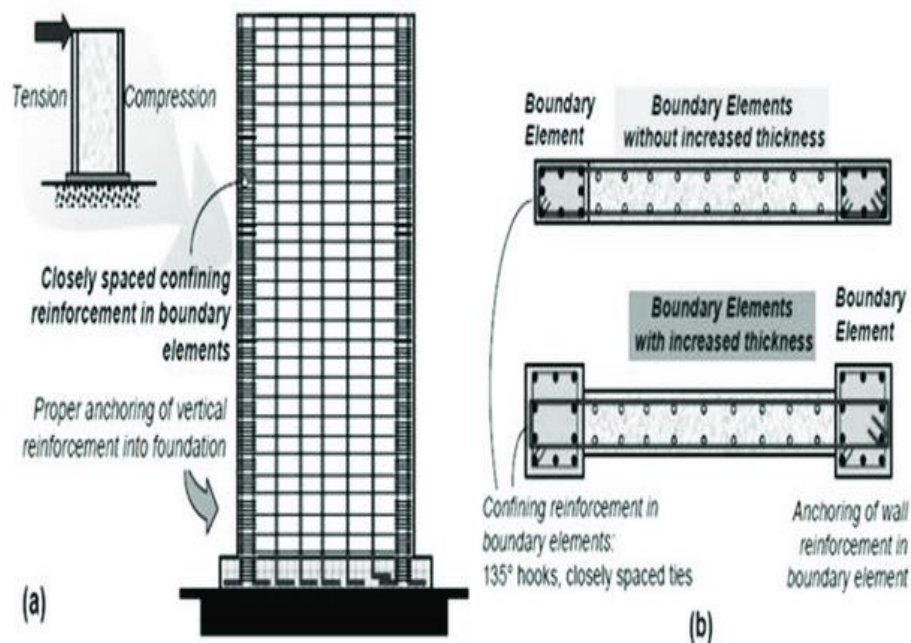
Boundary Element in Shear Wall (Ref: www.tutorialtipscivil.com)
